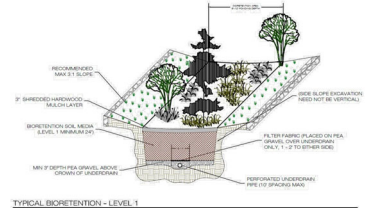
Typical Detail of Bioretention Basin Level 1 Design
